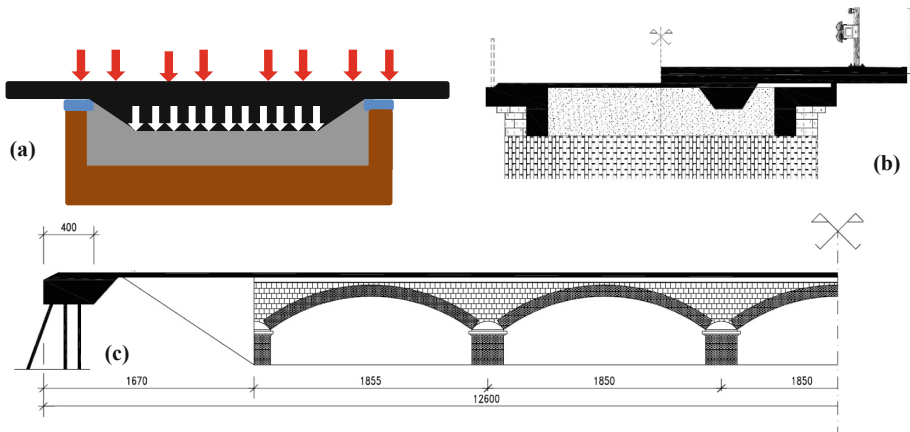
Reinforced concrete slab enlarging a bridge: (a) load transfer. Bridge on the Borbera river (retrofitting performed in 2014), (b) transversal and; (c) longitudinal section of the slab.
